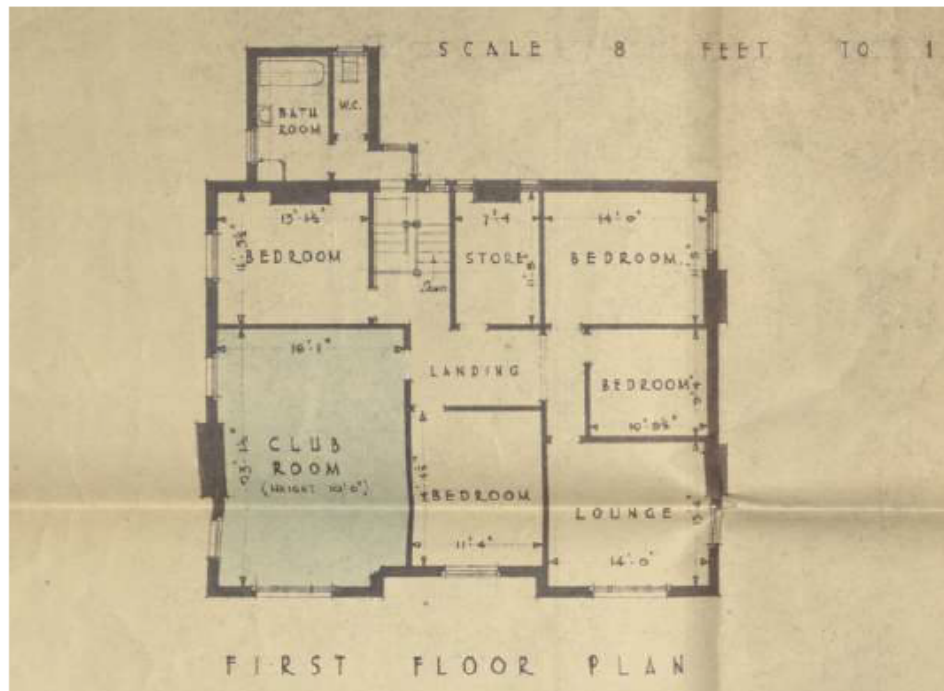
1951 Plan showing the arrangement of the first floor of the subject site.
